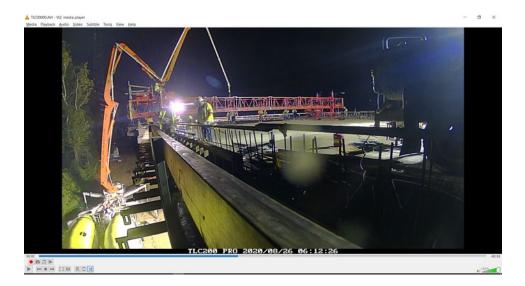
Photo. Identification of the concrete pavement machine as a major construction load from time-lapse camera
